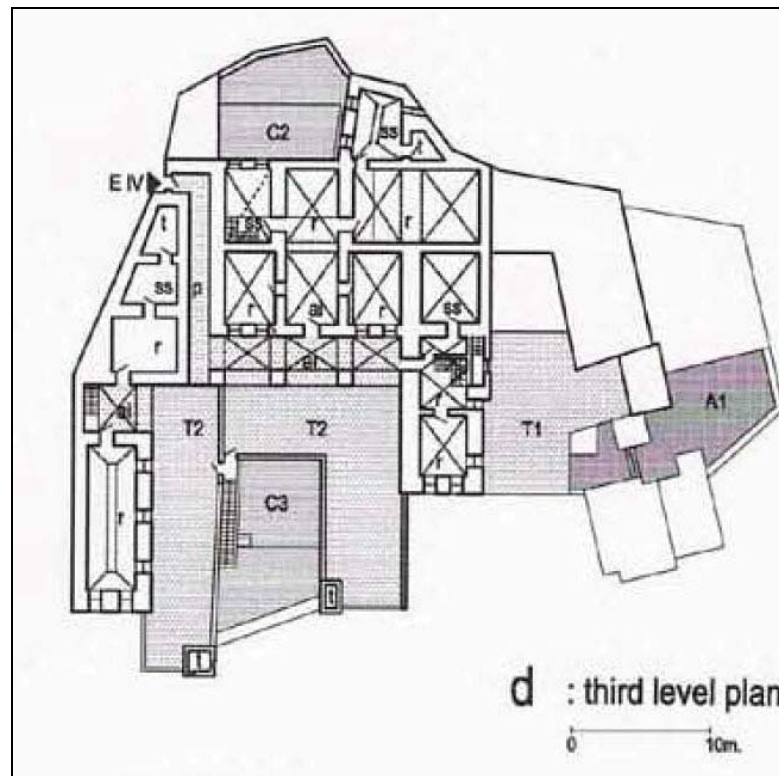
d: Third Level Plan (Alioğlu (2003.132-133))
